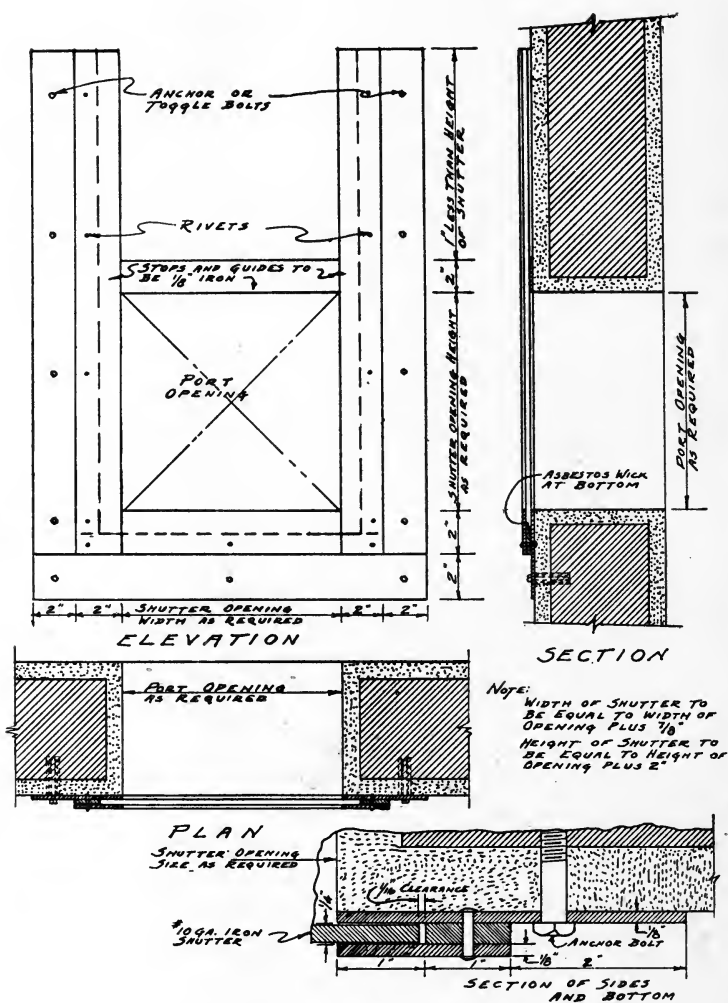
Example of port shutter construction. Although this construction shows rivets, spot welding is preferable.
